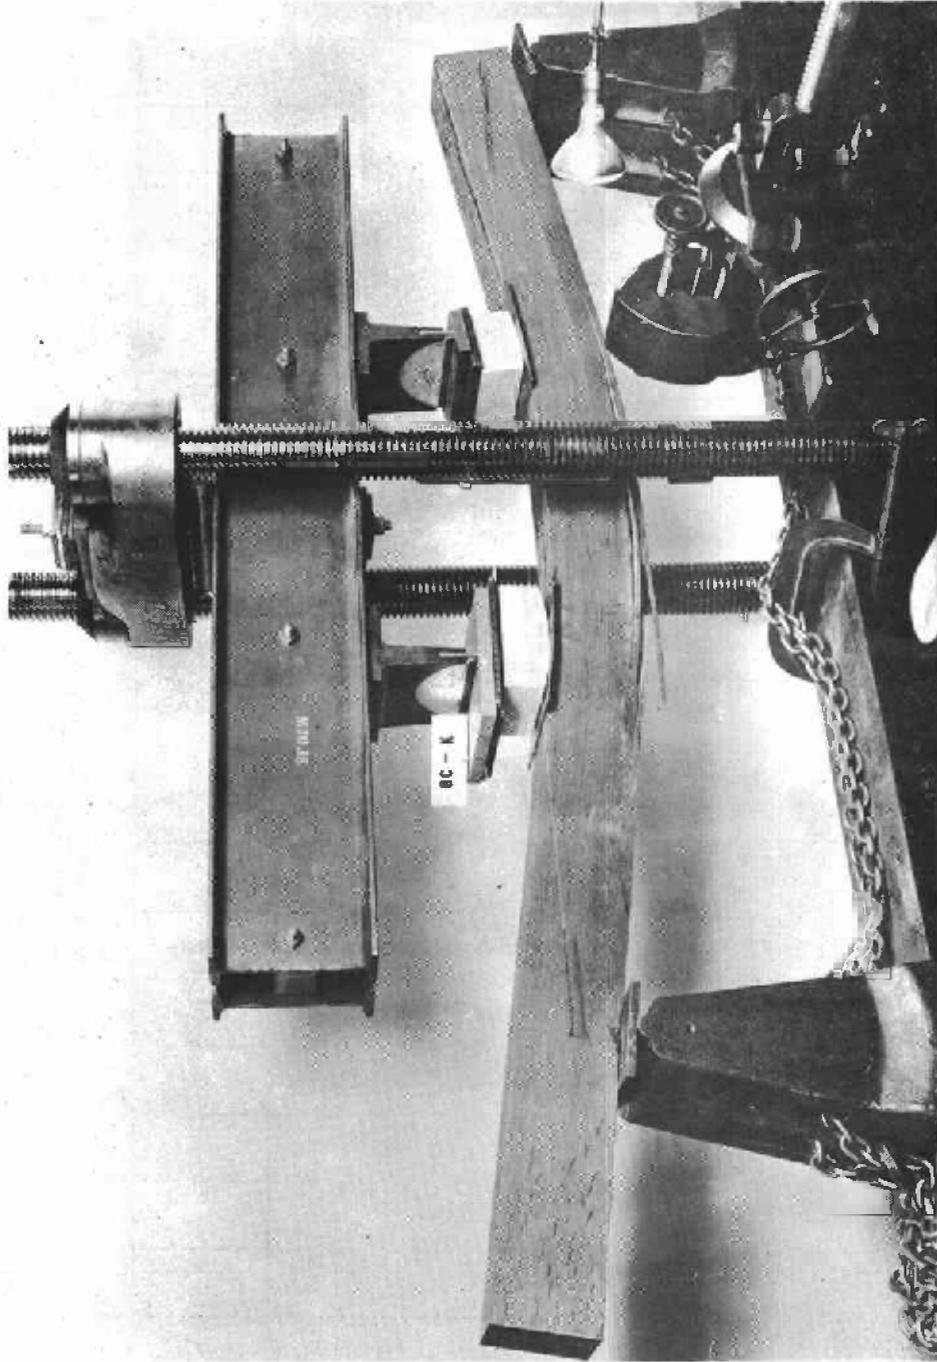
Typical splintering tension failure of a solid keel section without joints. Most beams failed in this manner; a few failed by simple tension.
